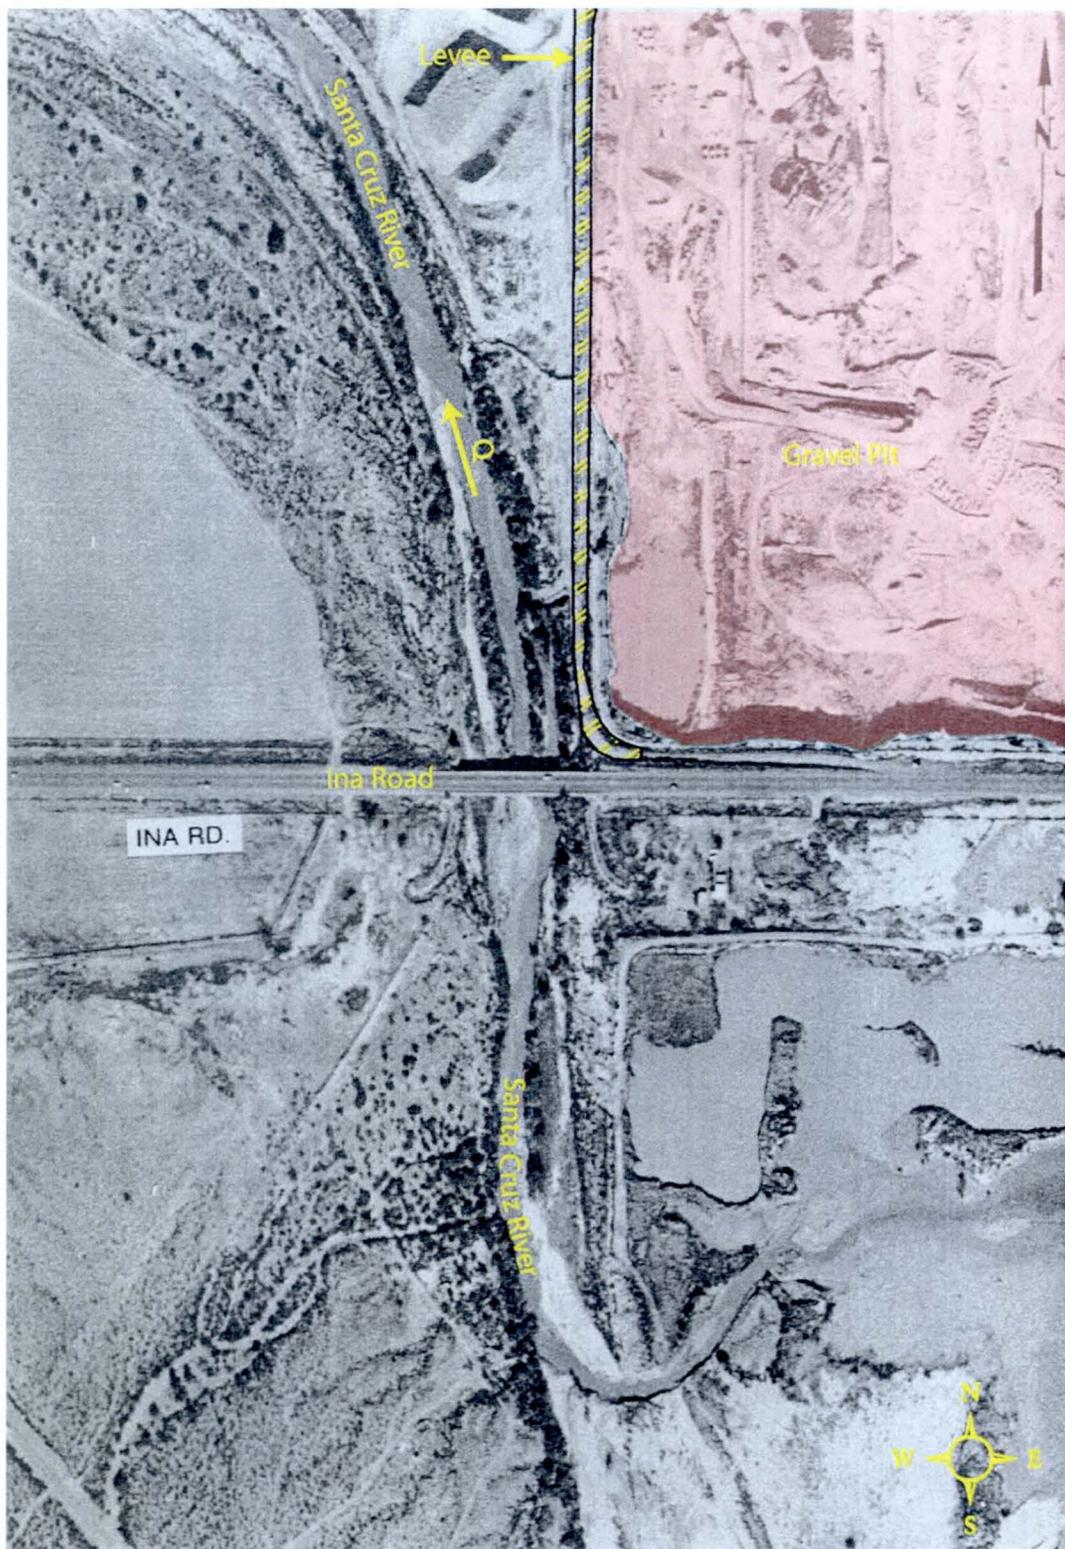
Ina Road Bridge site in December, 1982 (from PCDOT, 1984). Note the steep side walls and narrow setback from Ina Road at the Columbia Pit, as well as headcut into the inundated pit south of Ina Road.
